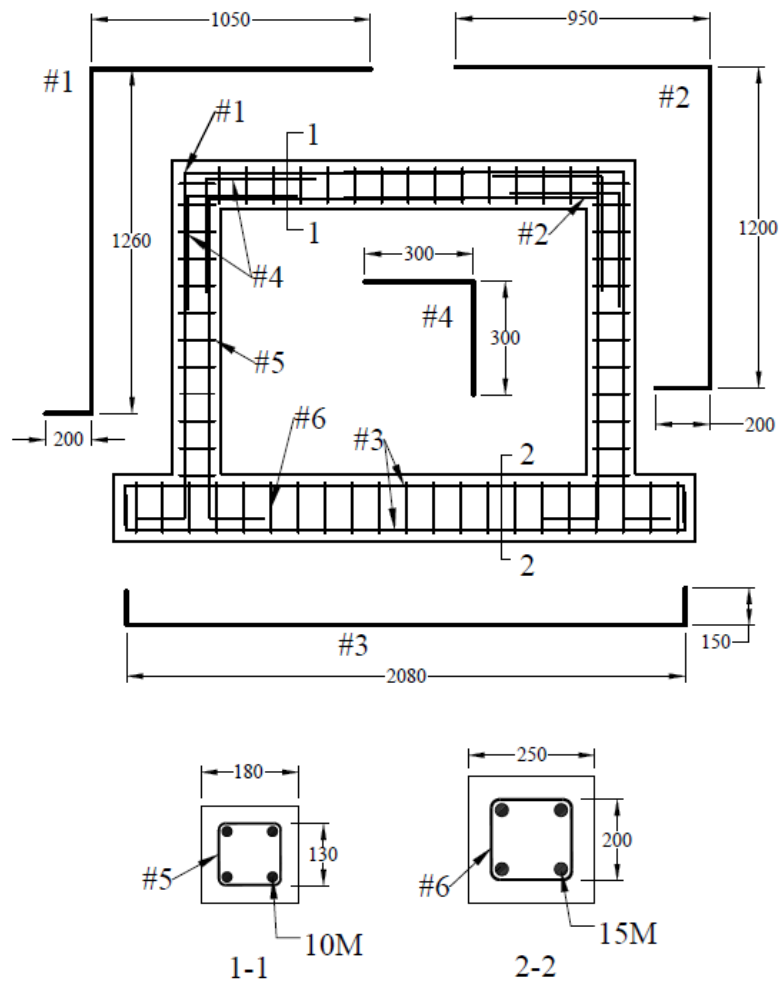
Reinforcing Rebar Detail (unit: mm)
